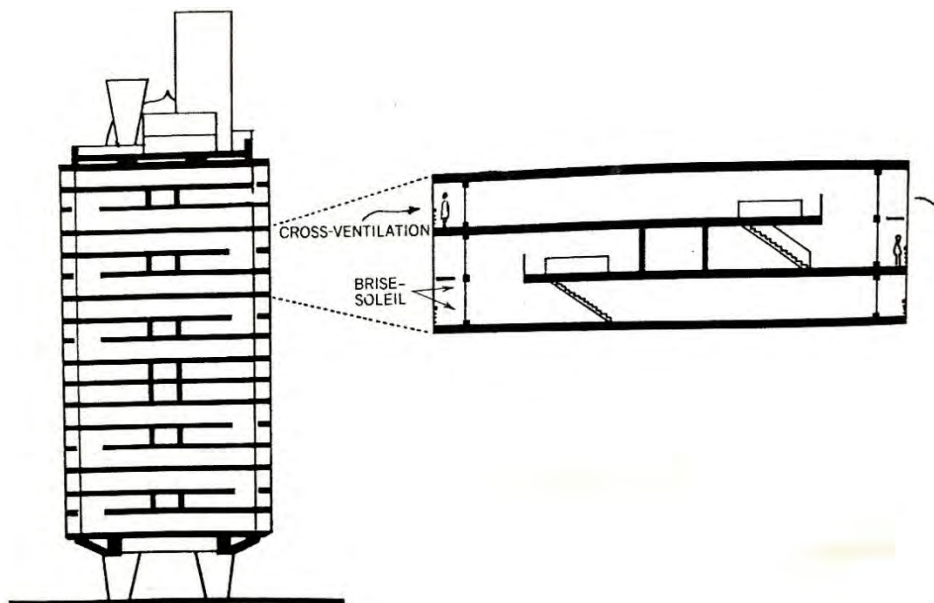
Le Corbusier designed Unite d'Habitation to provide cross-ventilation for each apartments. The apartments are designed as duplexes and corridors are provided only every third floor to ensure cross ventilation in each apartment. Source: (Lenchner, 2001)
